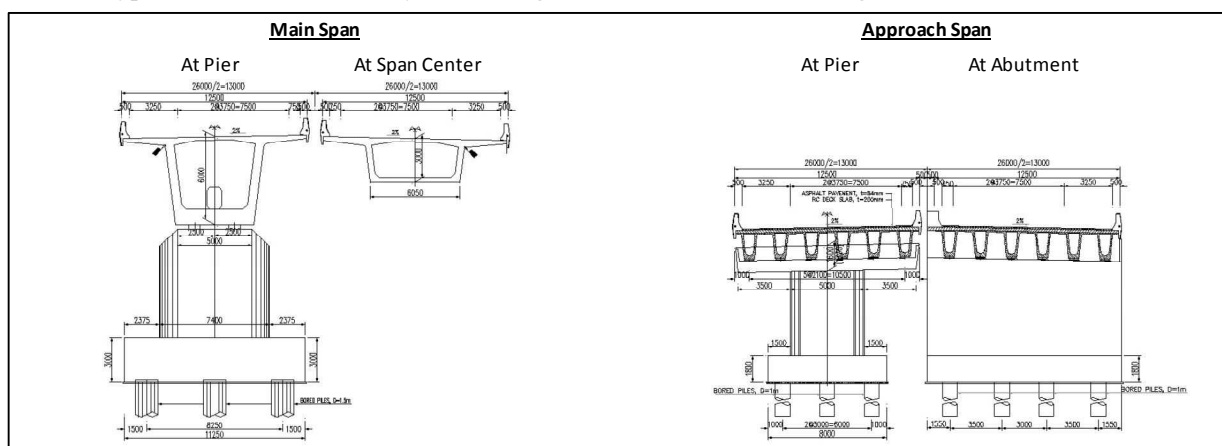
Typical Cross Section of Ky Lam Bridge in the F/S
